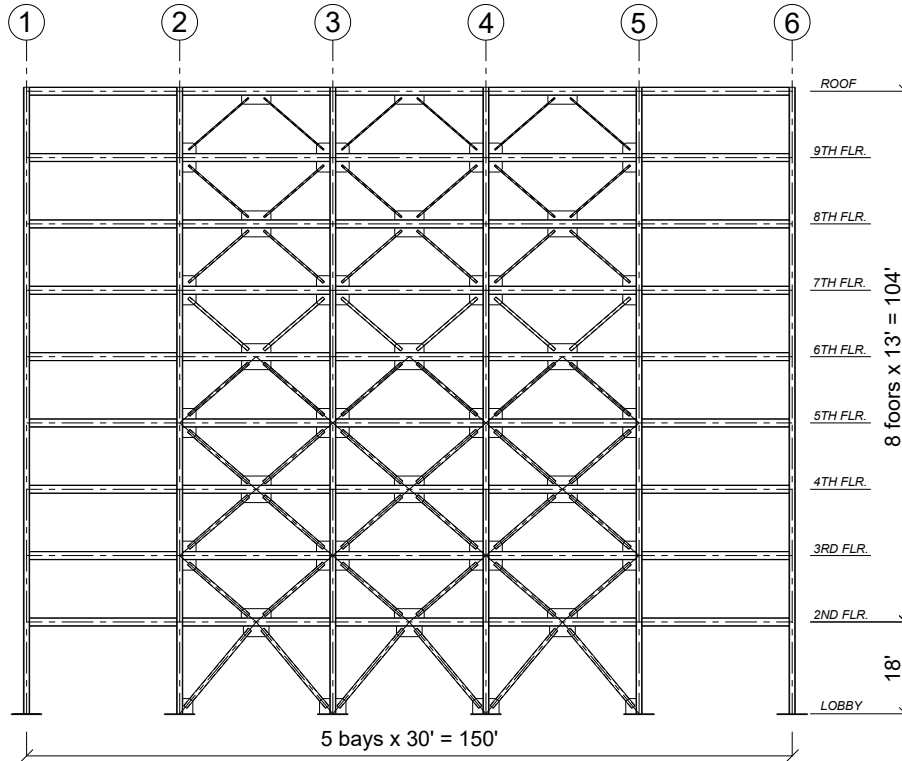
Elevation and brace configuration of the nine-story archetype building.
